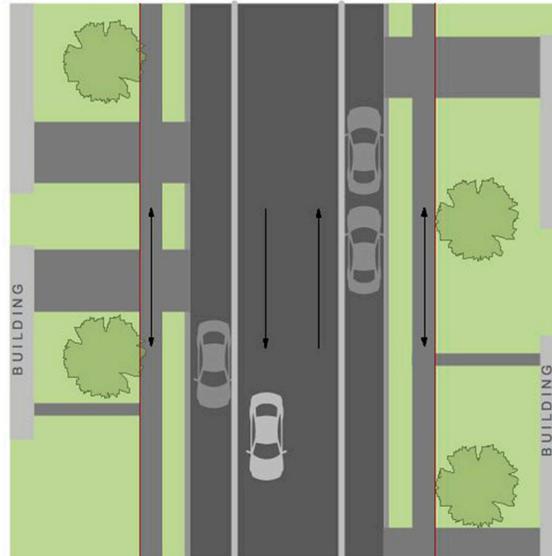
Example of a typical suburban street design (plan view; not to scale).
